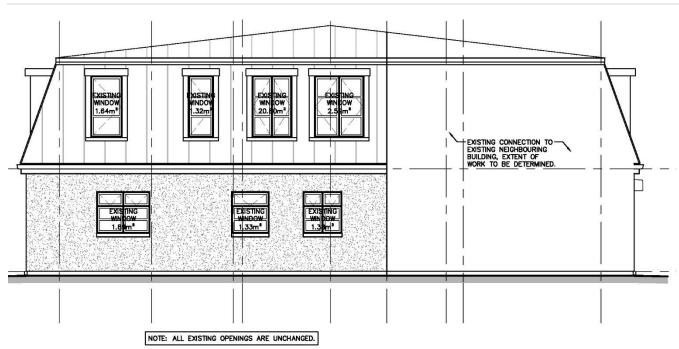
North Elevation (source: Shoalts and Zaback Architects Ltd.)
